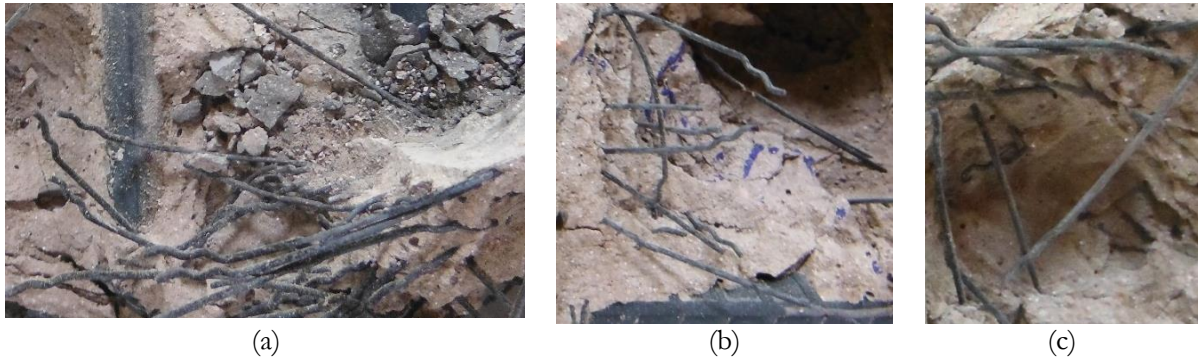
COL-C: (a) Color change and bending of fibers; (b) Cracks running along fiber; and (c) Hook ends embedment in spalled-off concrete.
